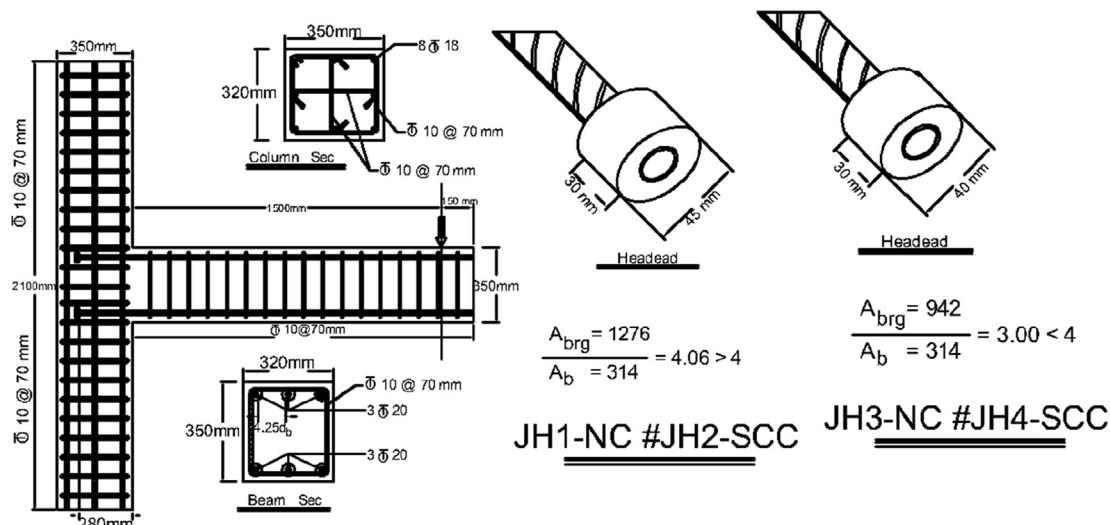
Dimensions and details of the specimens and Heads and threaded connections.
